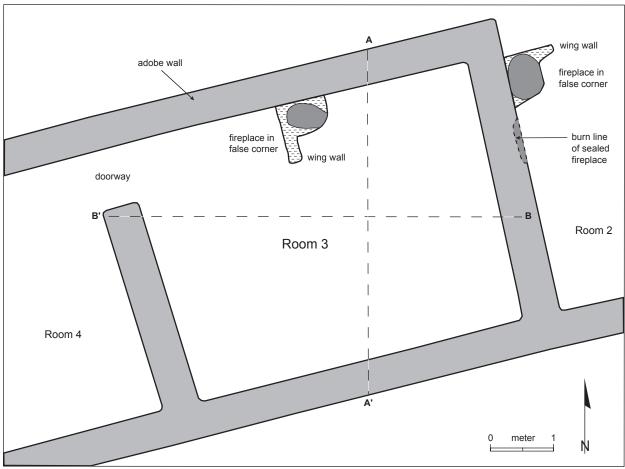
Plan of Room 3, Structure 1 at the Trujillo House.
